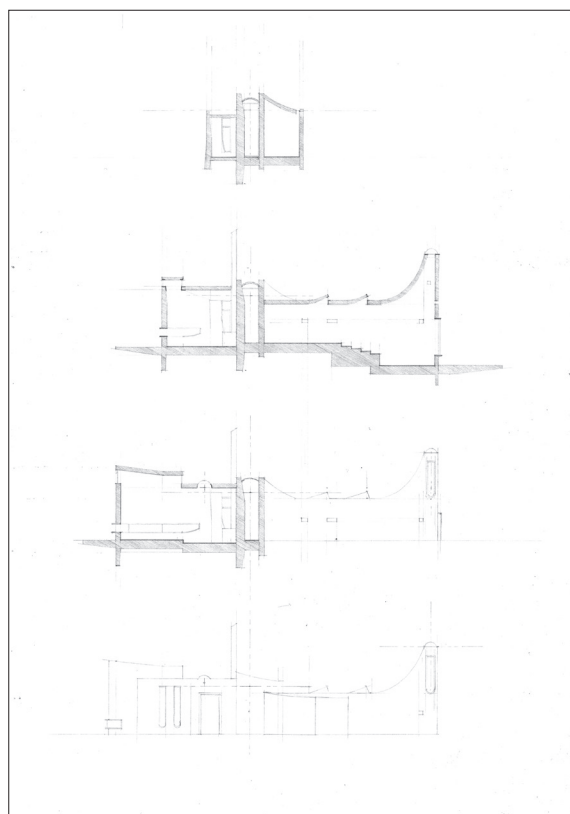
Forms and shapes of roof elements are transposed via compass tip from section to roof plan. Heights of lines and elements in section are also used to construct the projected shadow lines.
